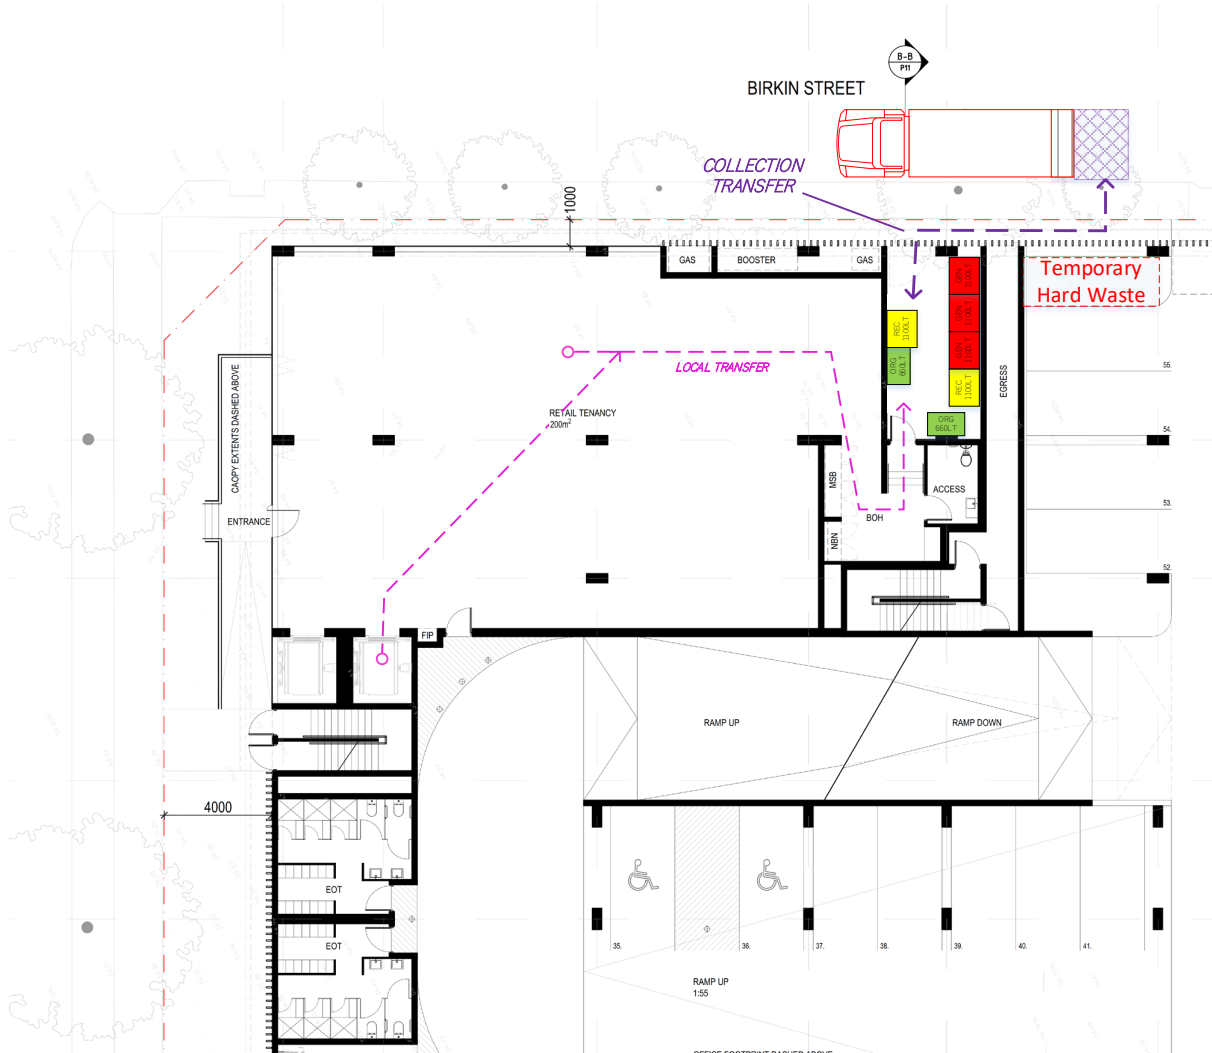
Site plan showing location of bin storage and disposal / collection transfer paths.
